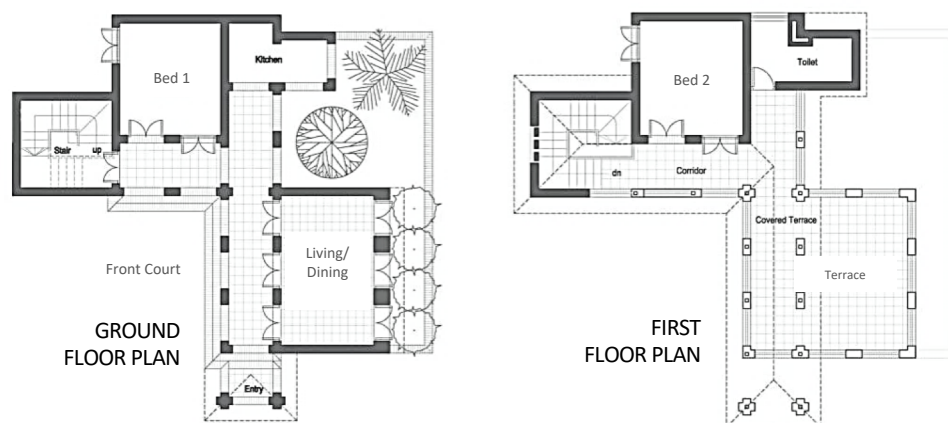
Ground floor plan and first floor plan of Bhatshala Complex
